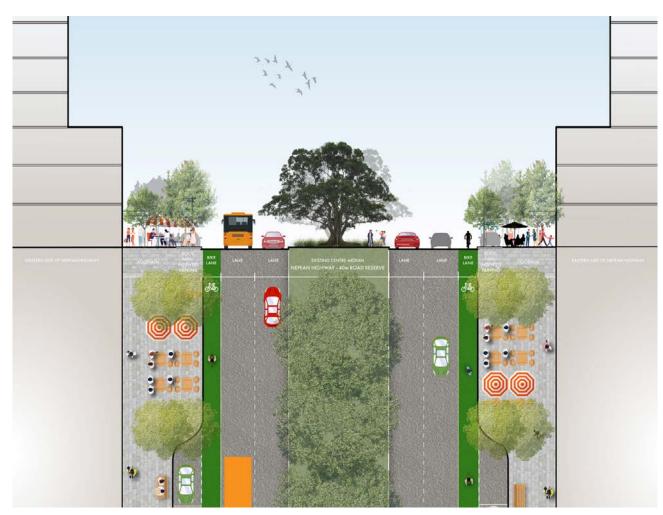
Example plan and cross section showing how Nepean Highway could be transformed.
